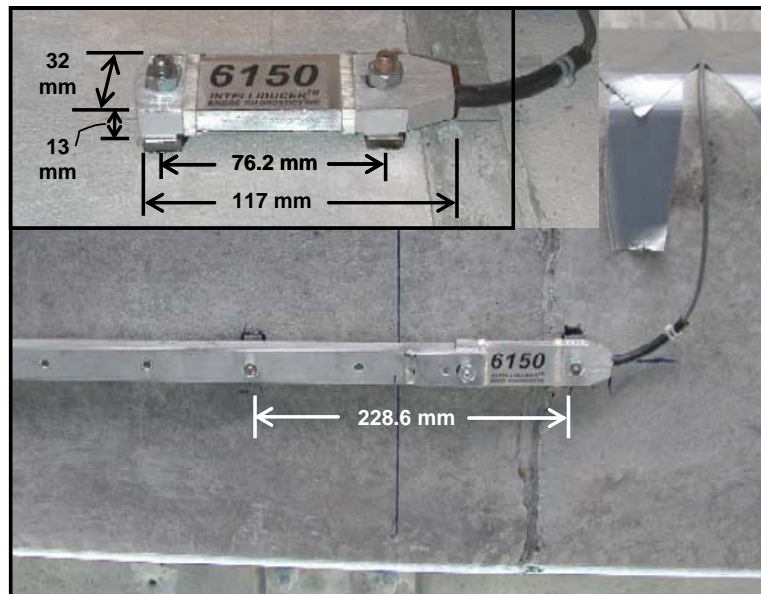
Intelliducer™ mounted on bottom of girder; Inset: Dimensions
